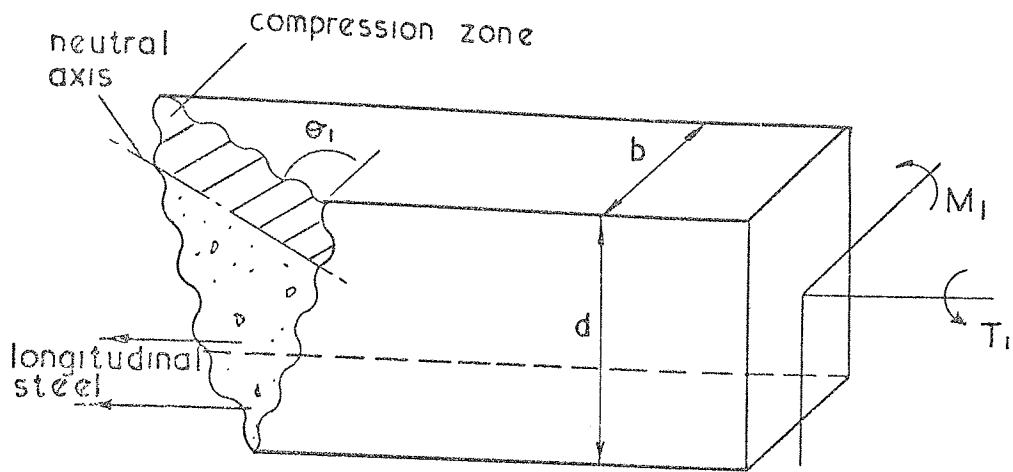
Mode I type of failure for concrete members with longitudinal reinforcement only
